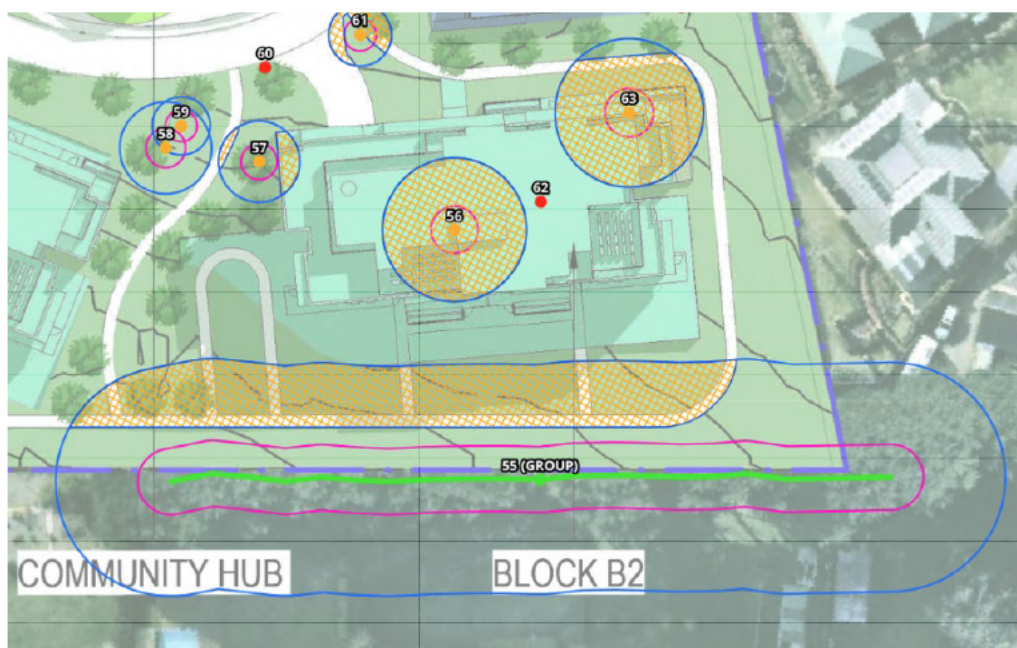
Excerpt from development impact plans showing extent of encroachment to neighbouring Derinya Drive pine trees (primarily posed by minor works such as pedestrian paths), which the Tree Protection Plan will be required to address design and construction measures for their protection (Source: Arborist Report, prepared by Arbor Survey)
